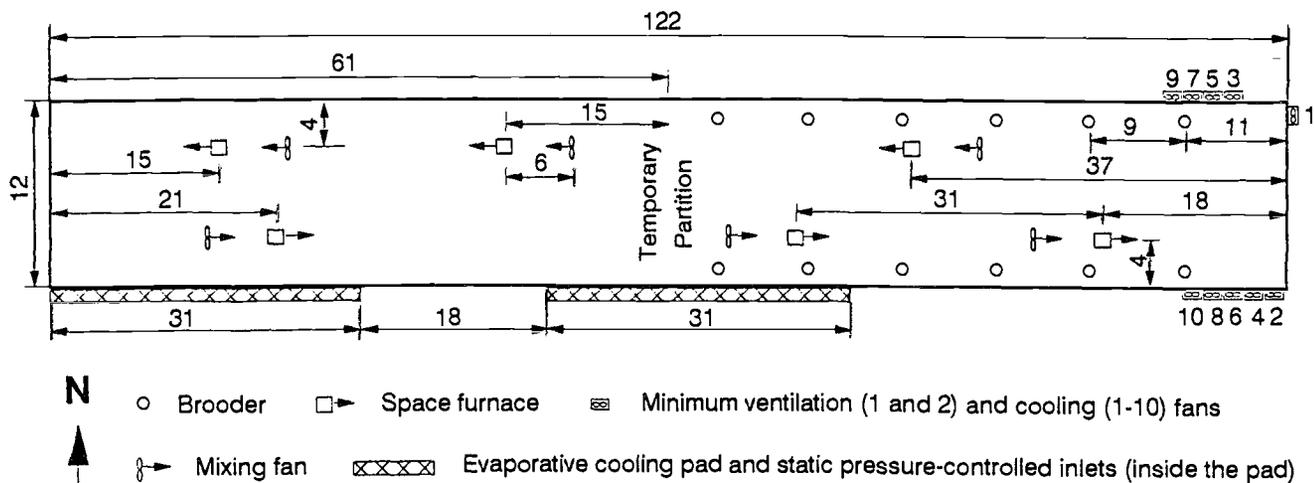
Schematic layout of the heating, cooling, and ventilating equipment of the experimental tunnel broiler houses. Side curtains used full length of building except over the two 31-m (100-ft) evaporative cooling pads (dimensions in meters – ft = m × 3.28).
